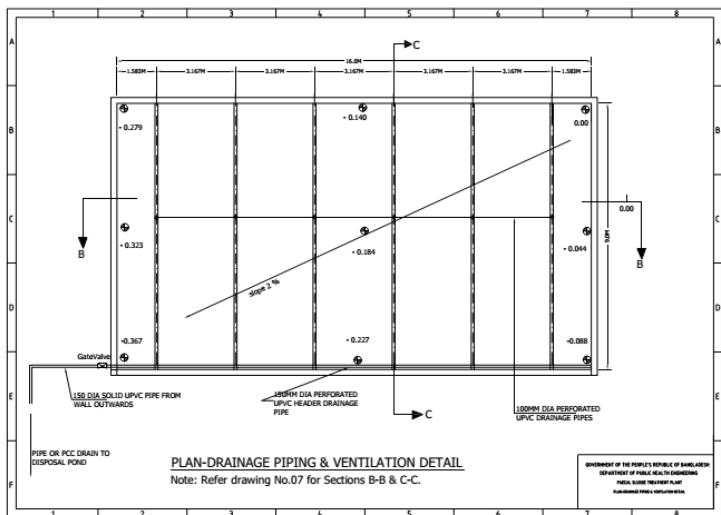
Layout of drainage piping of Faecal Sludge Treatment Plant
